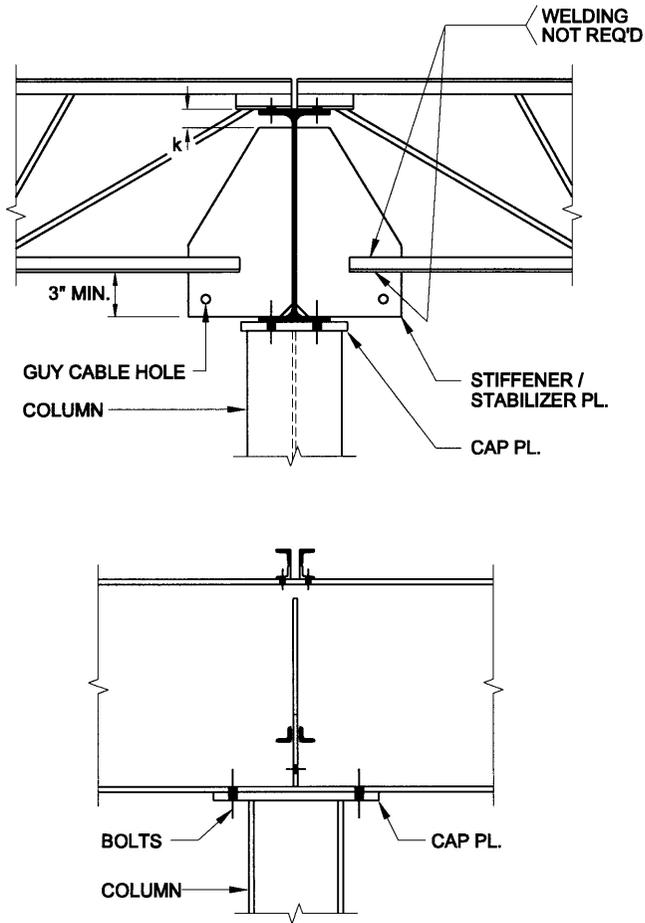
Beam framing continuously over column top, stability provided with stiffener plates, joist-chord extensions located above column top not welded.
